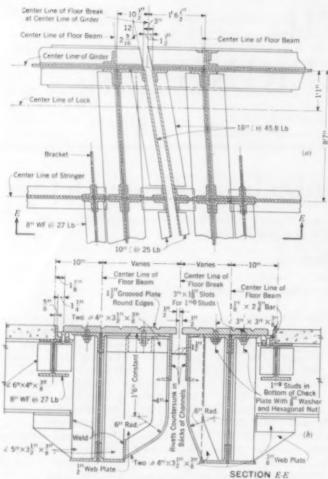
Construction of the Center Floor Break (a) Plan, (b) Typical Section E-E
